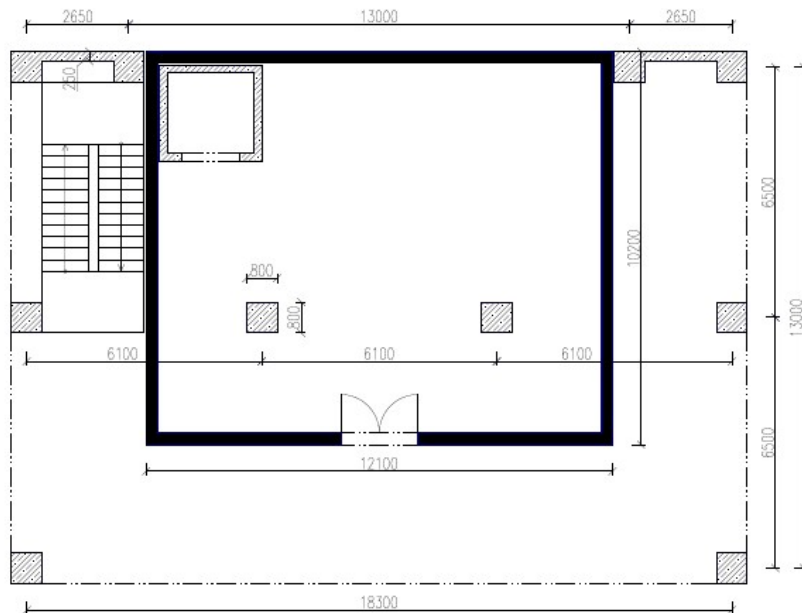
The scheme of a structural system of the first floor (an existing structure of the silo is marked by a solid hatch)
